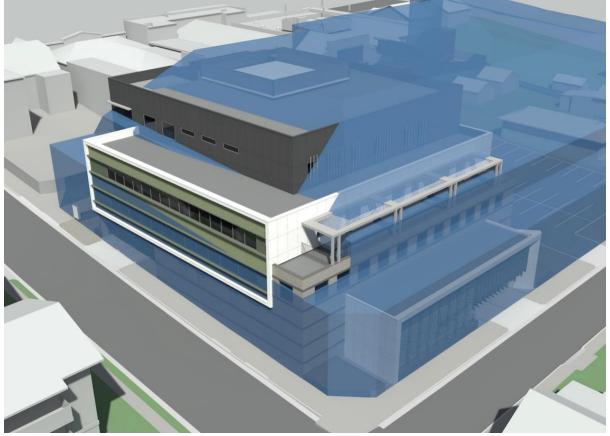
Proposed built form from Date Street (west) in relation to DCP building envelopes
